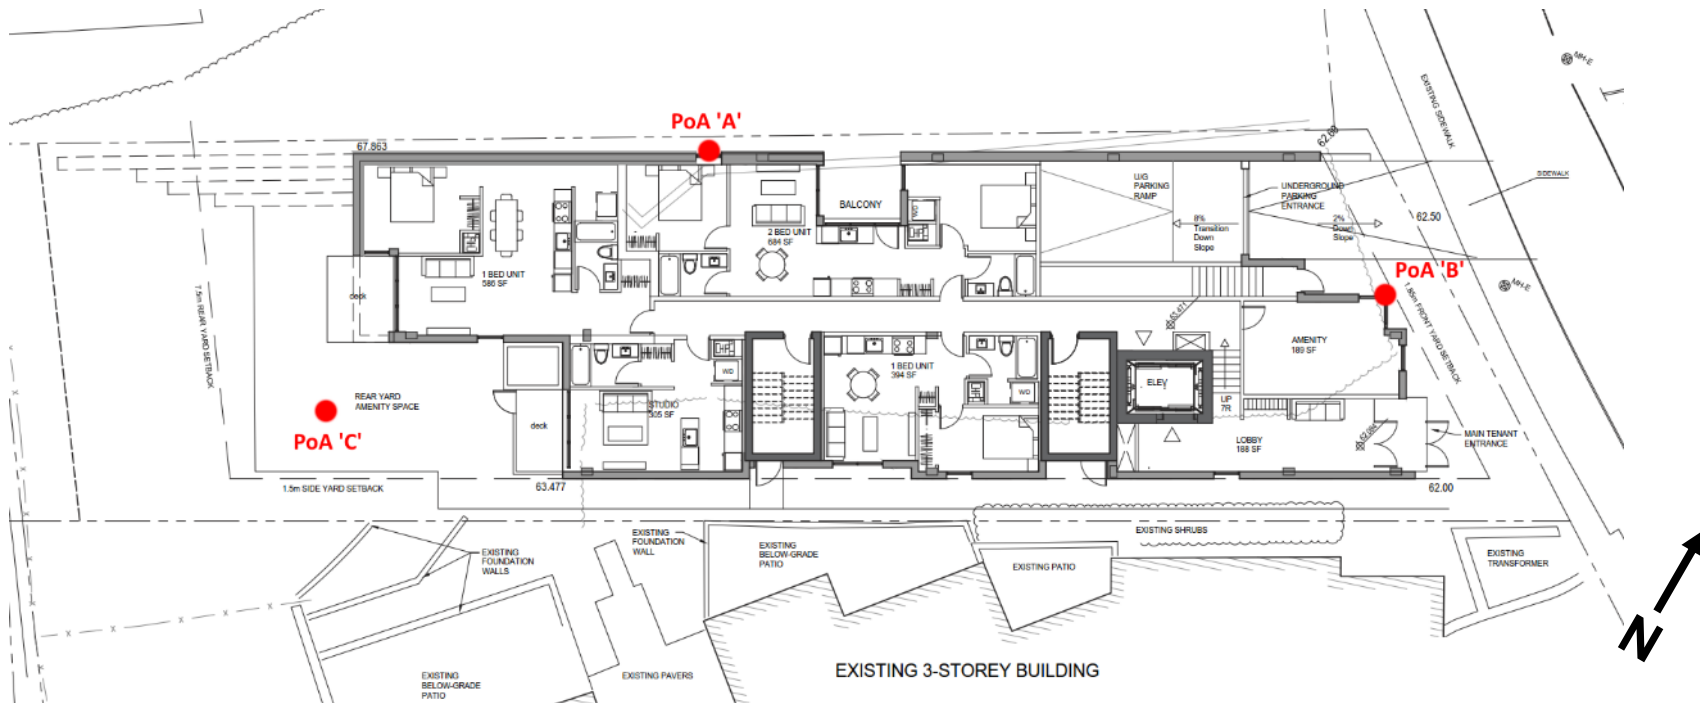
Site plan showing location of Points of Assessment PoA 'A' to 'C' on the ground level.
